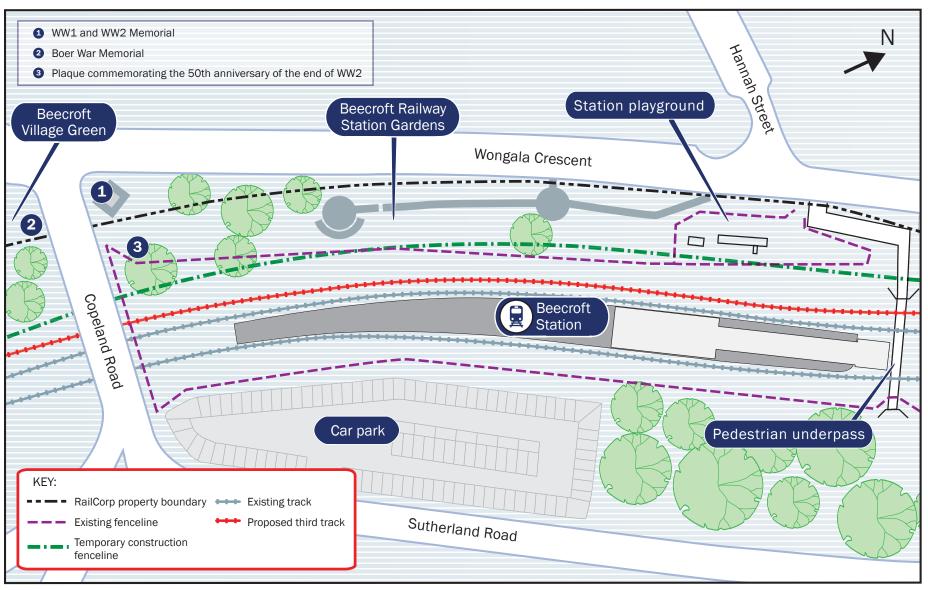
Extent of proposed construction works in the vicinity of Beecroft Station
